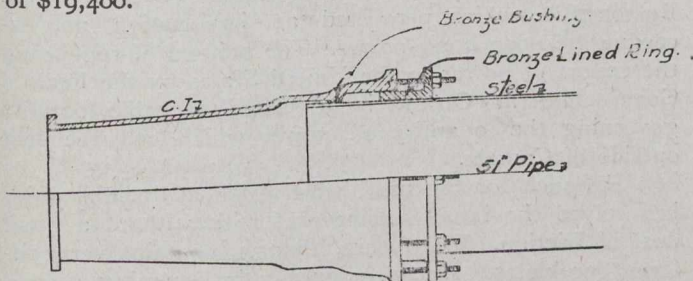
Detail of 51-inch x 42-inch Reducer Expansion Joint.
